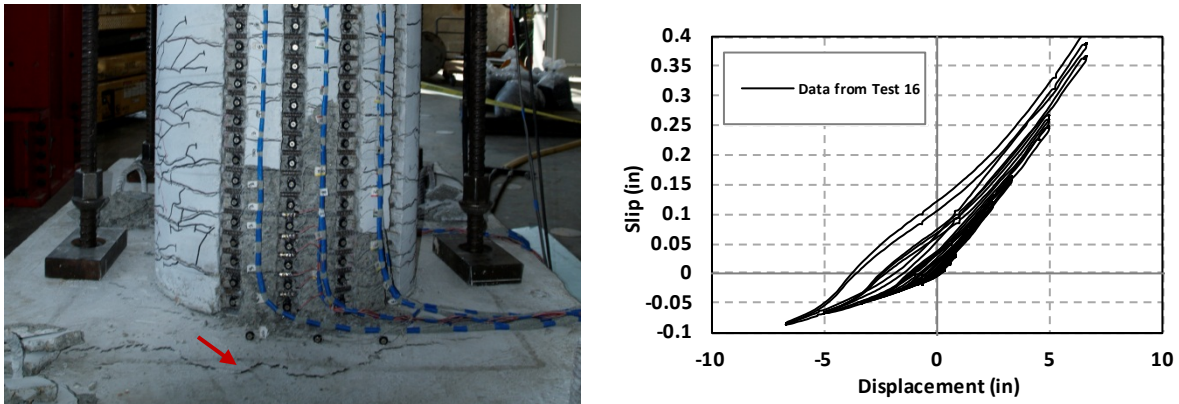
(Left) Crack on the footing near the tension side and (Right) Bond slip hysteretic response of the column
